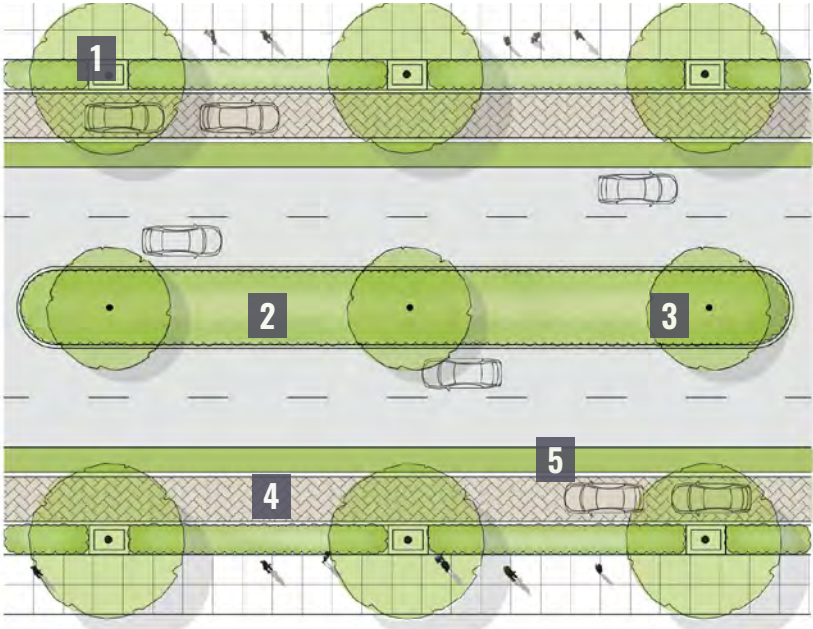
PLAN VIEW OF TYPICAL GREEN STREET RETROFITS IN A DOWNTOWN COMMERCIAL STREET
